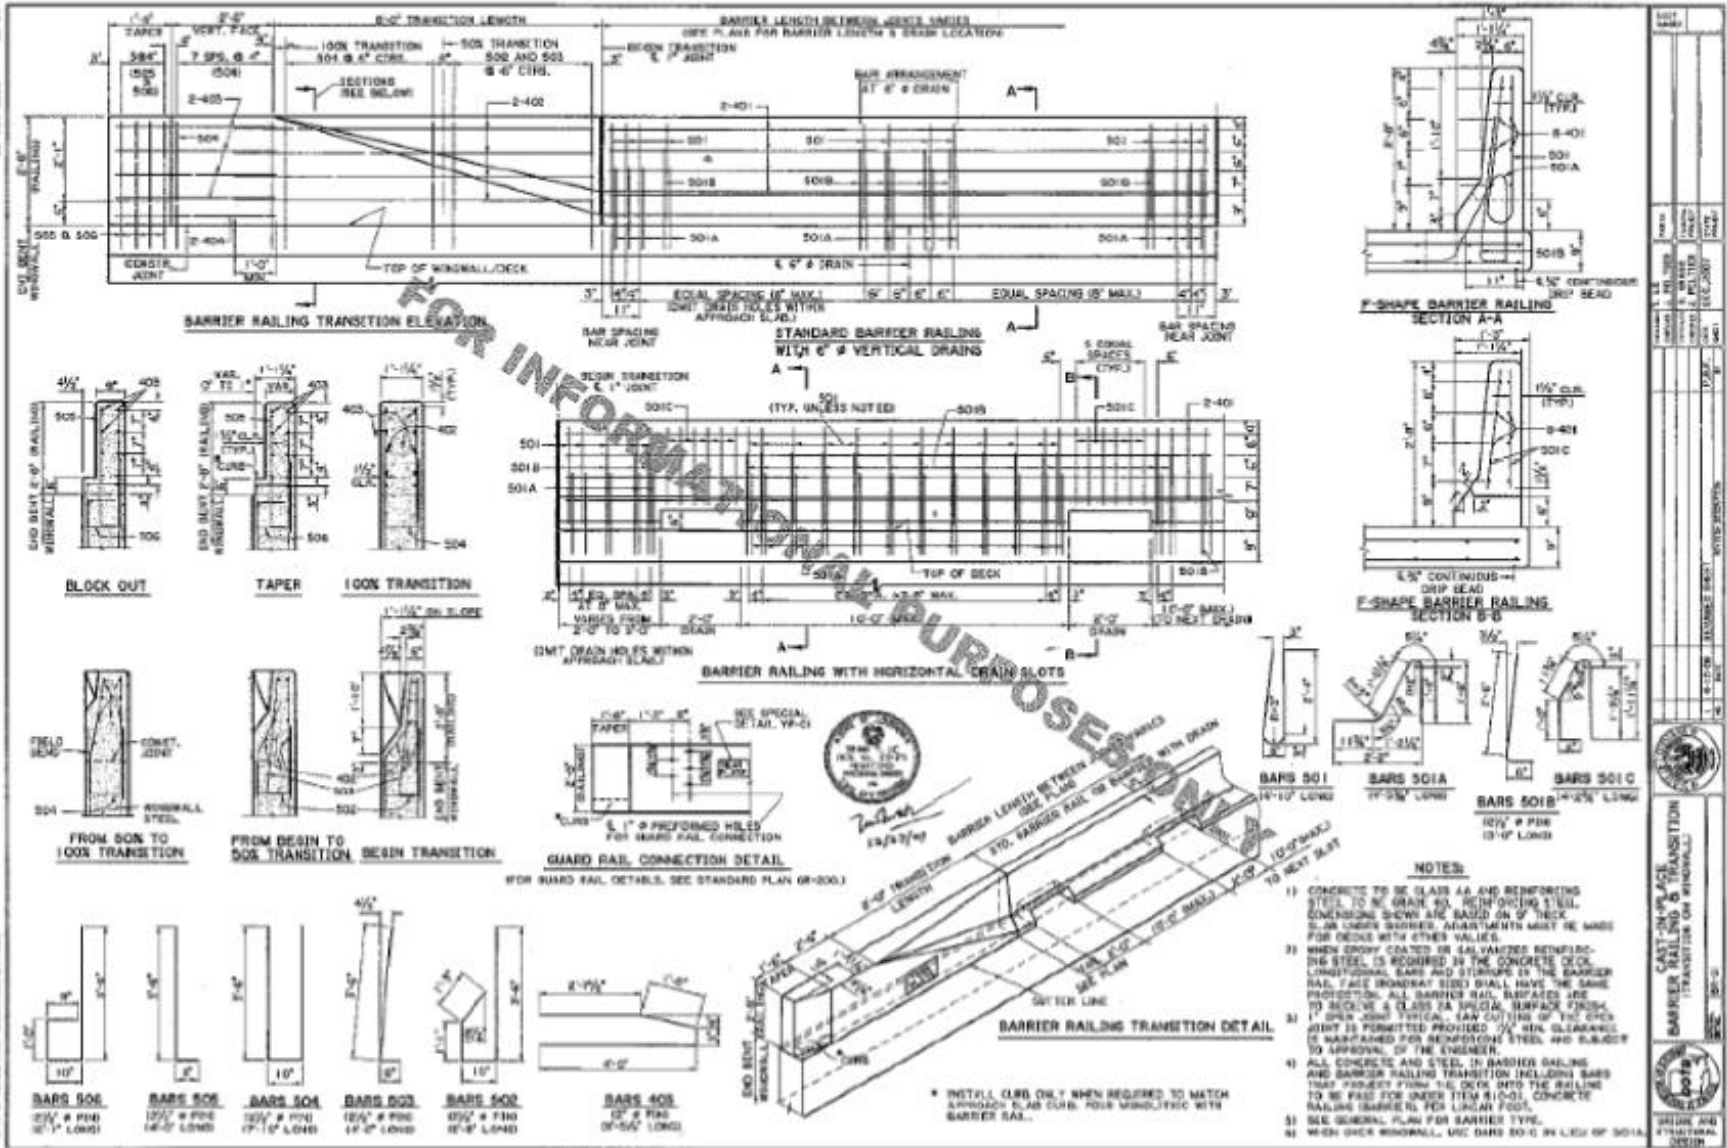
Drawing for LaDOTD F-Shape Concrete Barrier.
